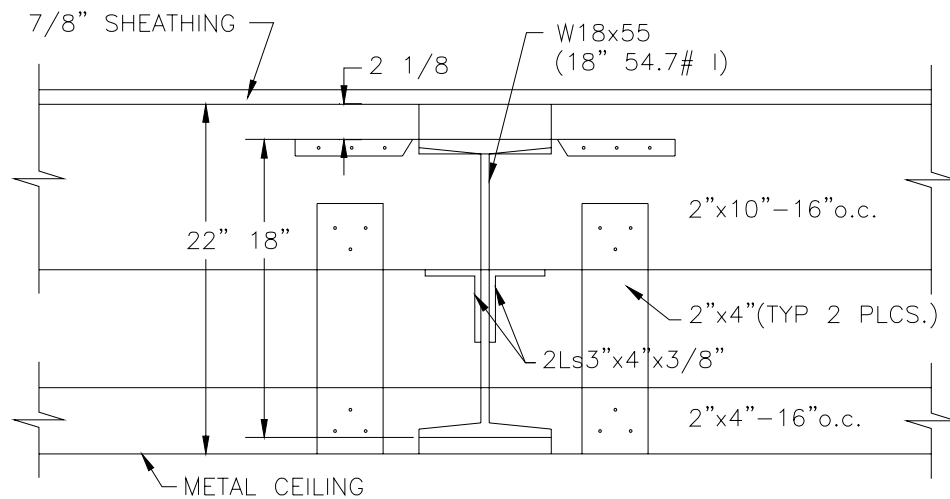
Typical Joist-to-Beam Connection Detail
